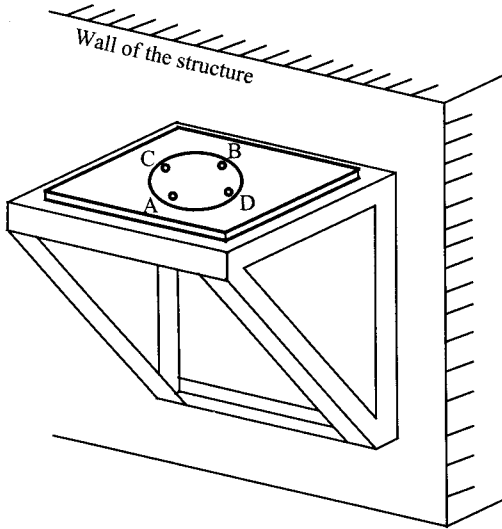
Horizontal type of datum plate fixed to the wall of a structure.
